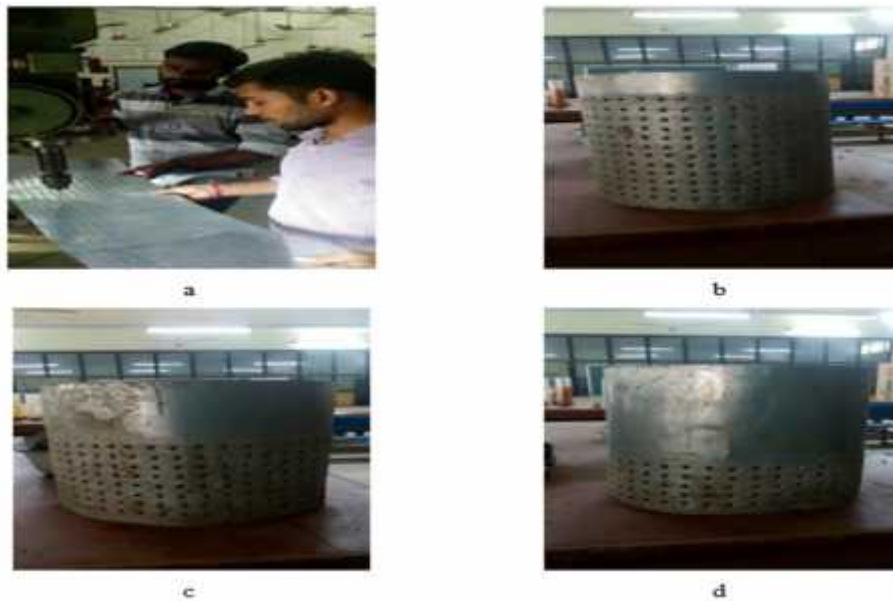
(a) Placing of holes in both the directions, (b) $b/D=0$ mould, (c) $b/D=1$ mould, (d) $b/D=2$ mould
